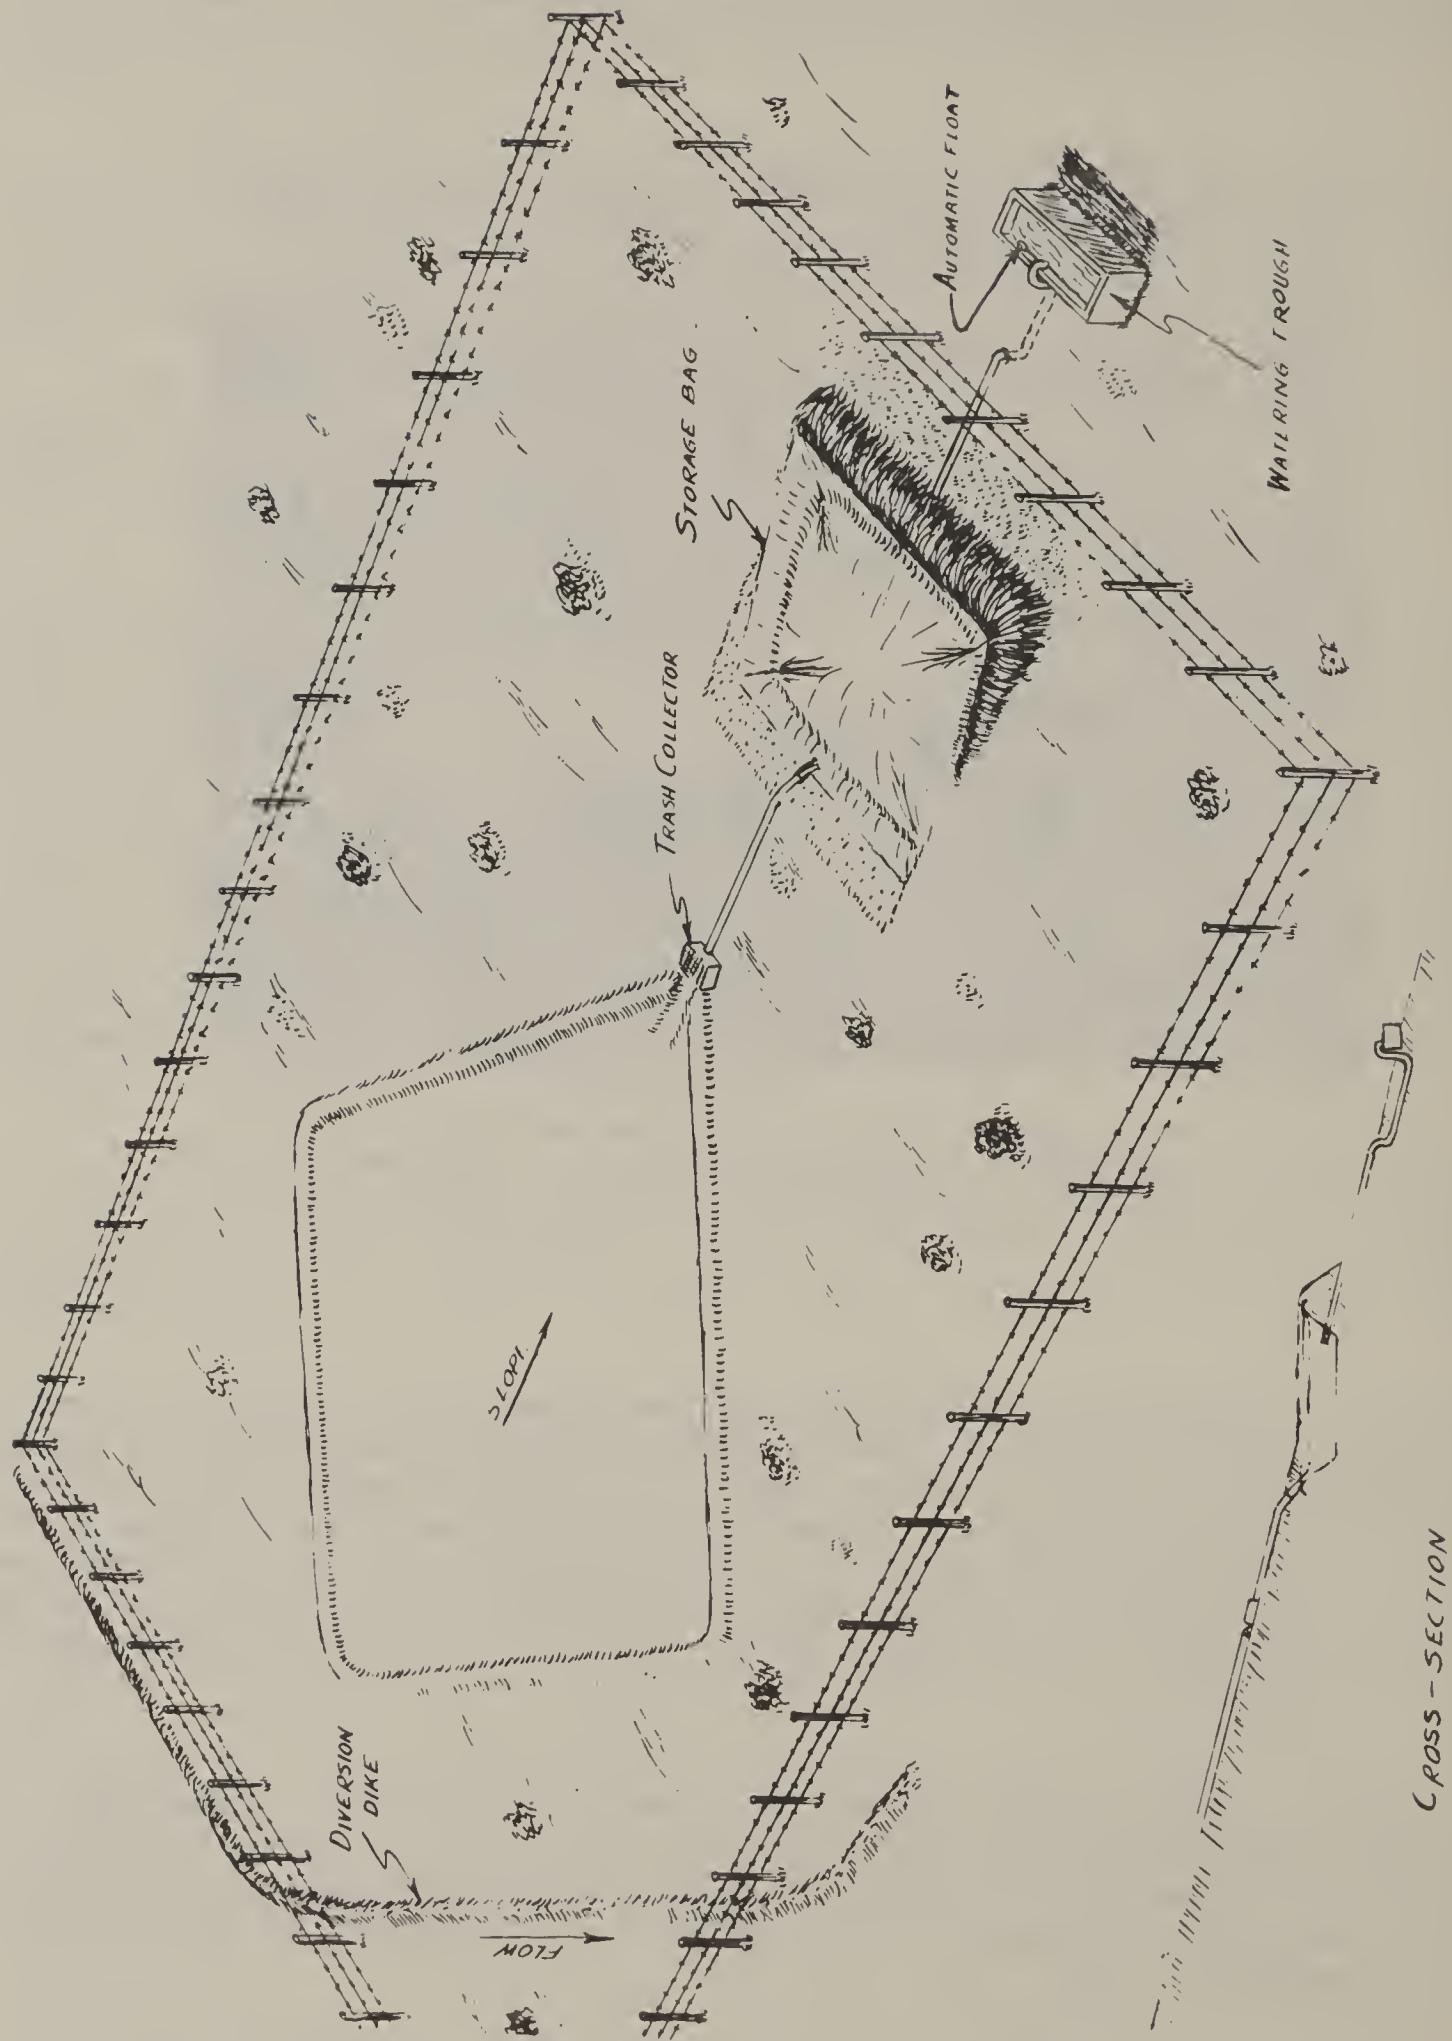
Layout for collection of water from a ground cover installation. The bag has not been filled.
